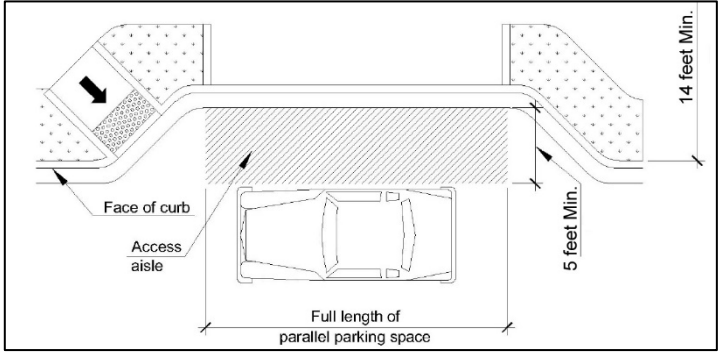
Parallel On-Street Parking Space Next to a Wide Sidewalk
